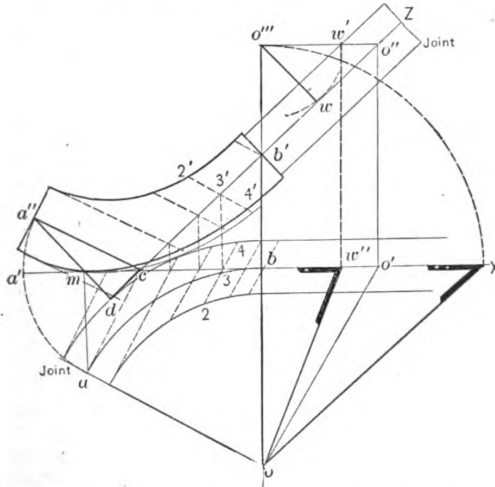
Simple Method of Laying Out Face Mold for a Wreath Over a Stretchout Stringer.
